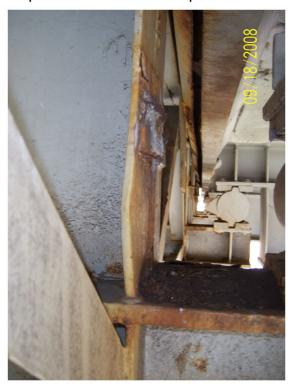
In several locations where a backer bar was not used the weld lacks full penetration between the flange and web plates.
